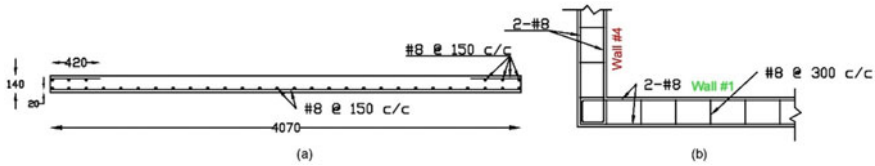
Dimensions (mm) and reinforcement details of RC slab (a) and RC band (b)
